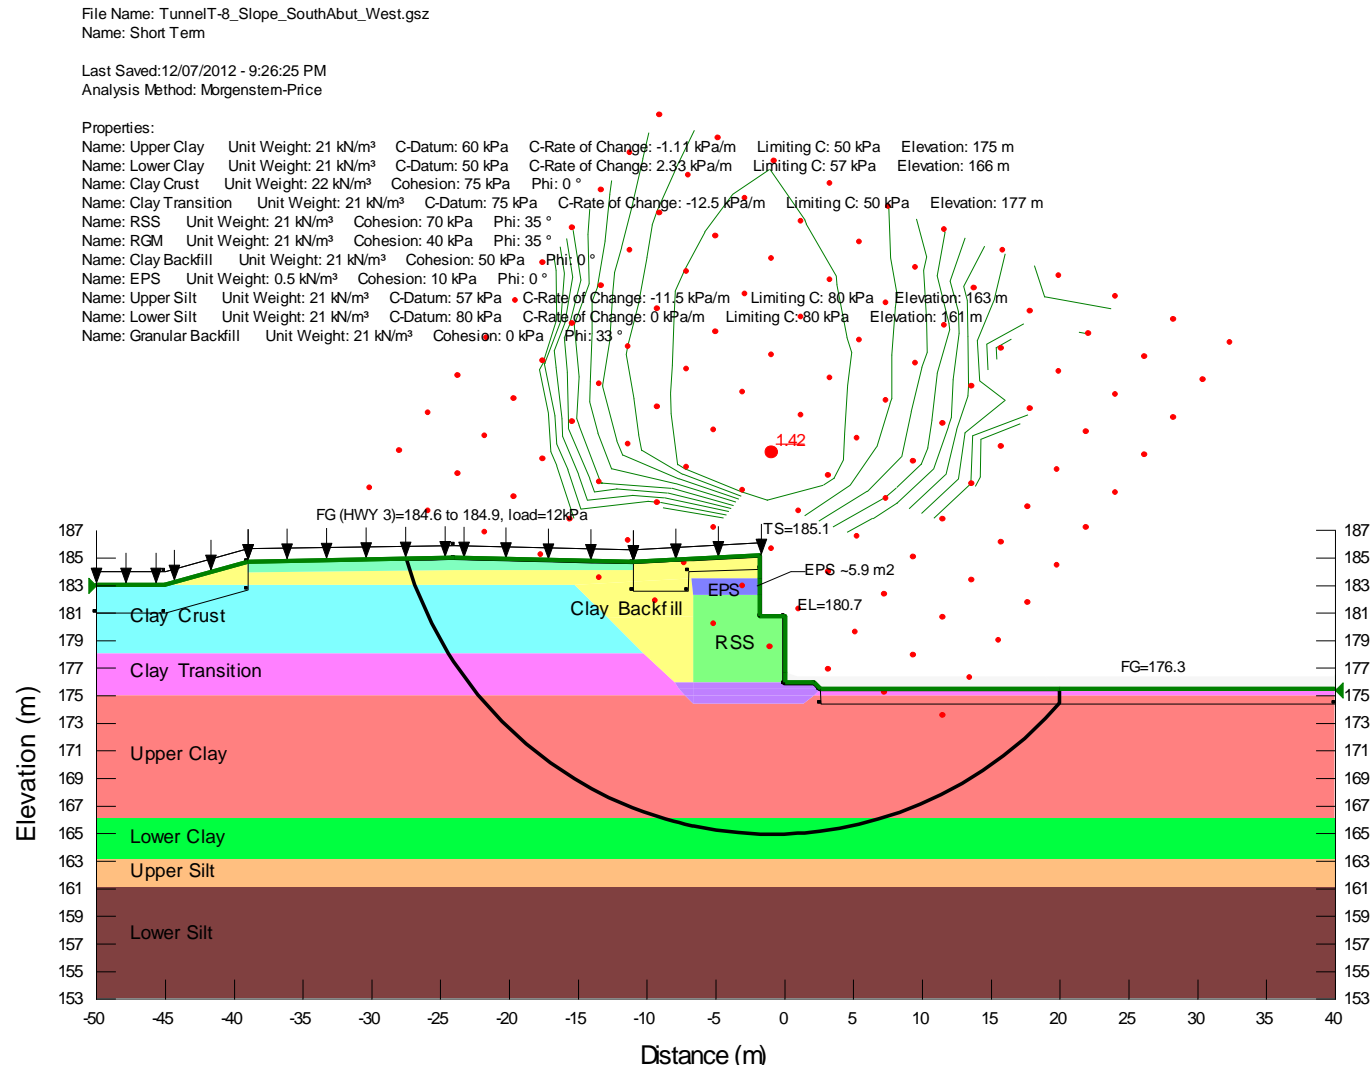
Global Stability Result – South Abutment (West Segment) – Short Term (Undrained) Loading with Sub-base
